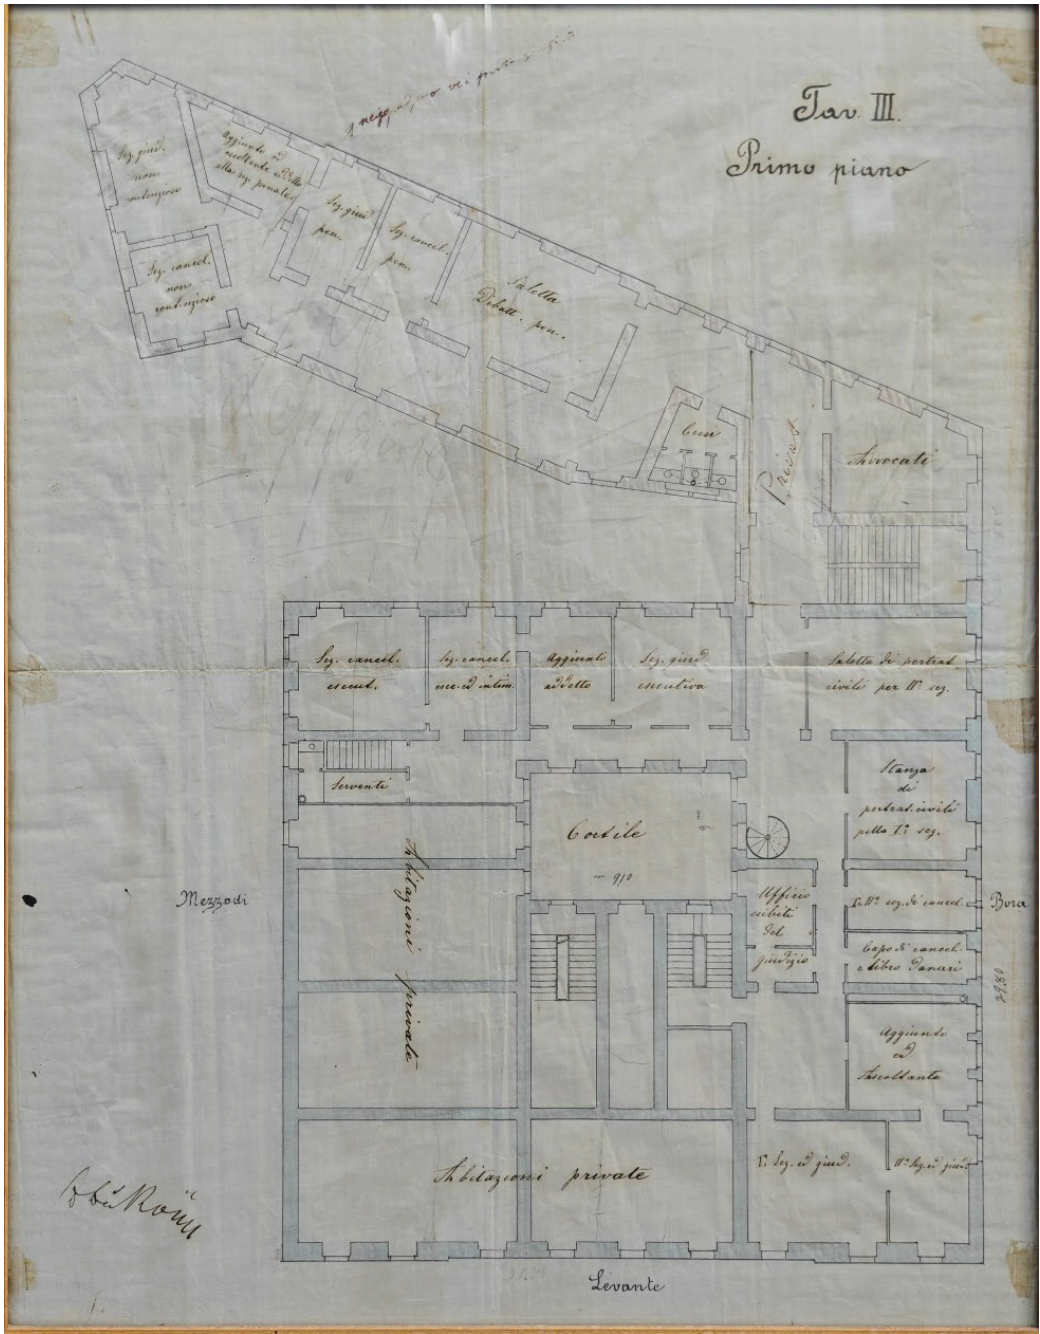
Plan of the first floor (*primo piano*) of Bajamonti Palace, with plans for the expansion of the new wing towards the west, which was never built.
